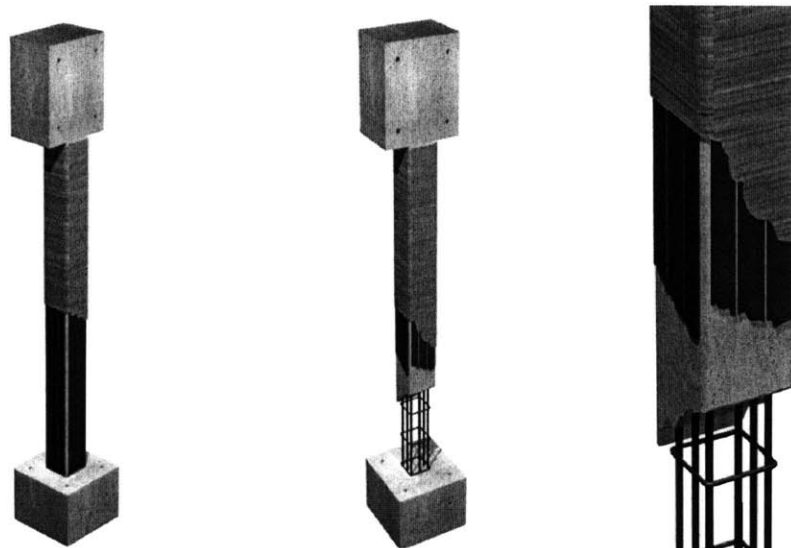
Concrete Retrofit with CFRP (Crawford et al)
